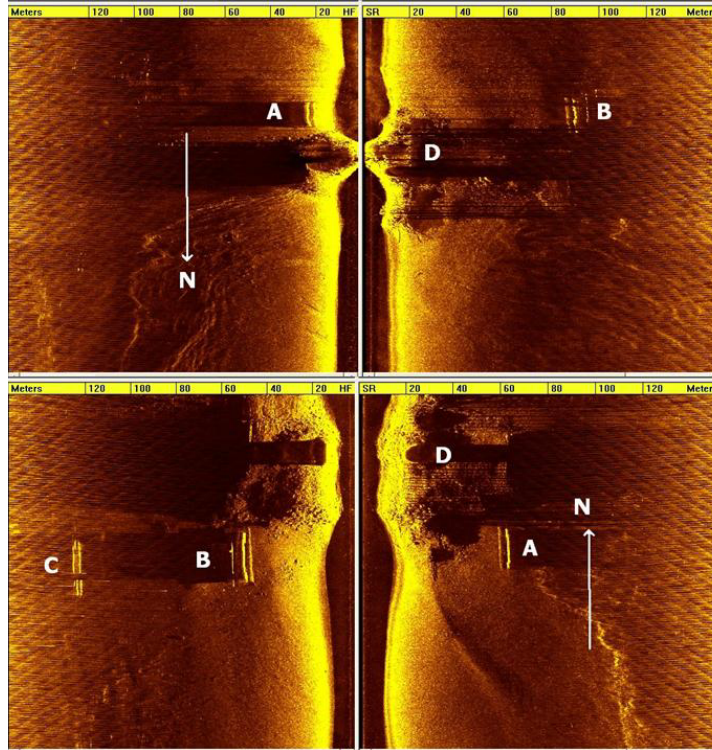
View of the highway bridge at Sakonnet with piers marked as A, B and D. The drilling barge (near B) and the old railroad bridge can also be seen in the picture.
